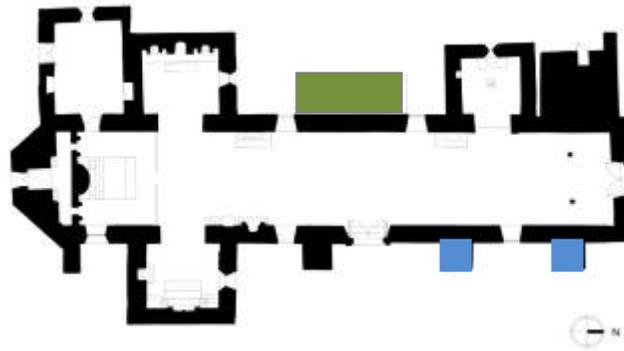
Floor plan of the church with two new buttresses included (light blue). Green buttress is a widening of the west central wall (1.2 m height aprox.).
